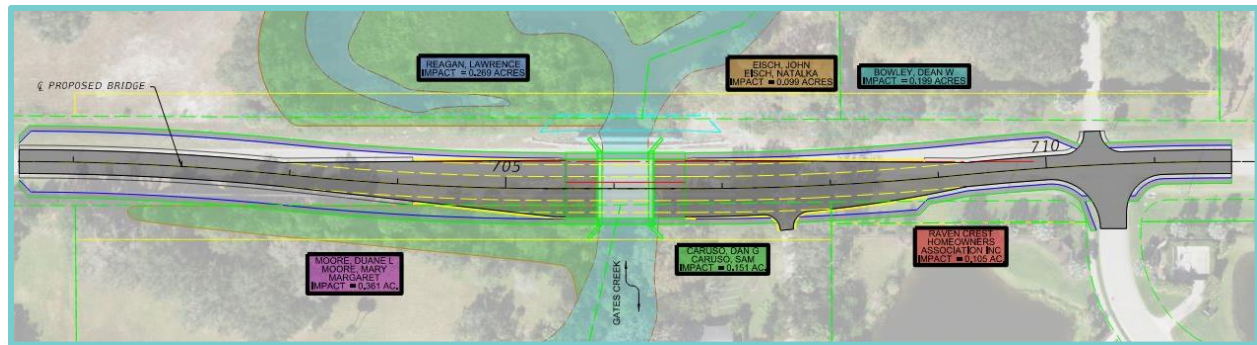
Upper Manatee River Road Temporary Bridge
